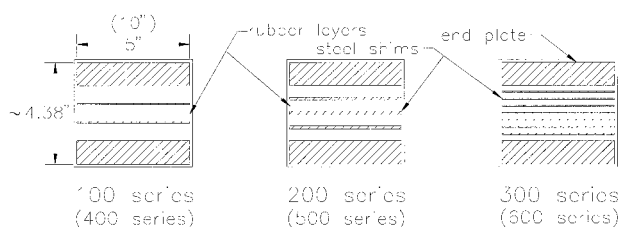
Details of 5 and 10 in. Elastomeric Bearings Tested [Details in Parentheses for 10 in. Bearings (1.0 in. = 25.4 mm)]
